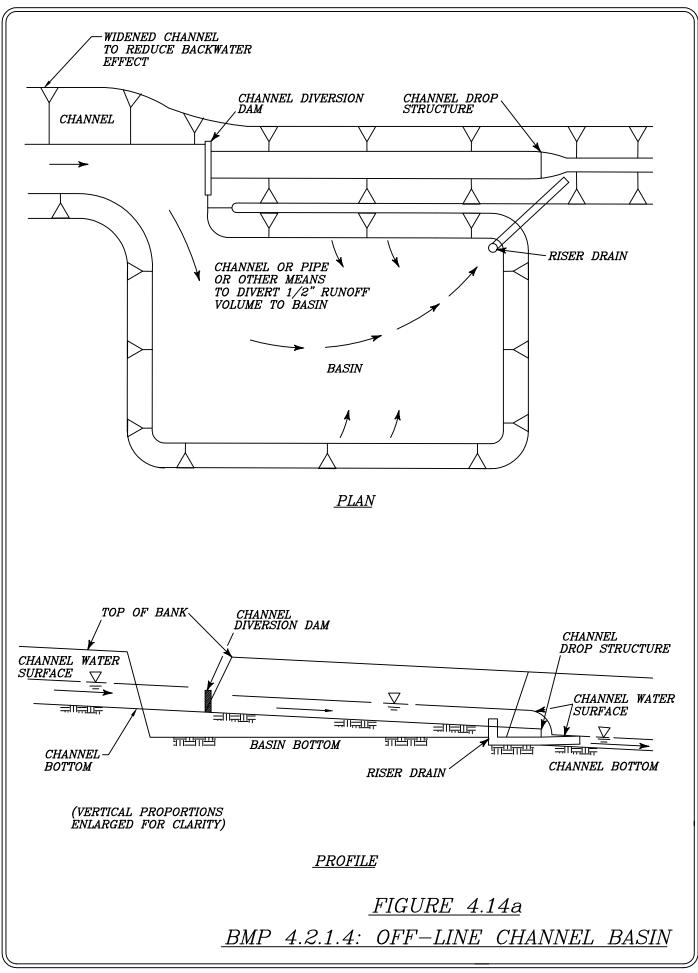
and b provide basin plan and profile information and general notes for construction.
